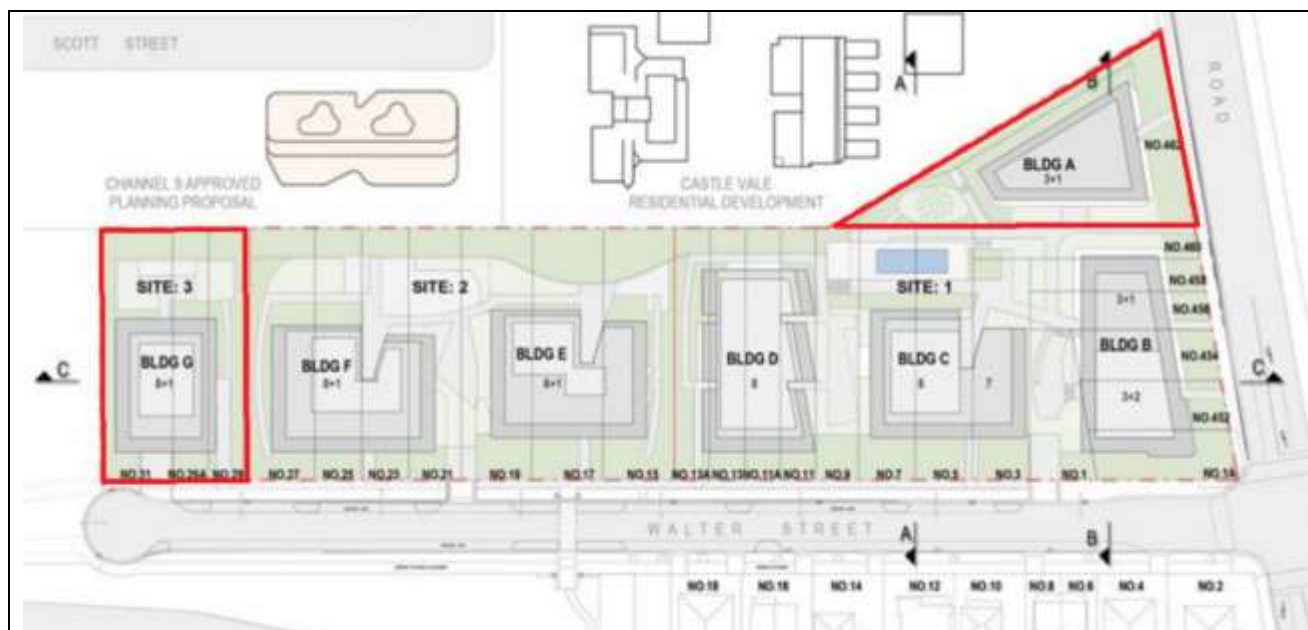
The DA excluded 462 Willoughby Road and 29 – 31 Walter Street, shown outlined in red. WDCP 2023 Part B 7.6.2 (c) (4) is shown below.
